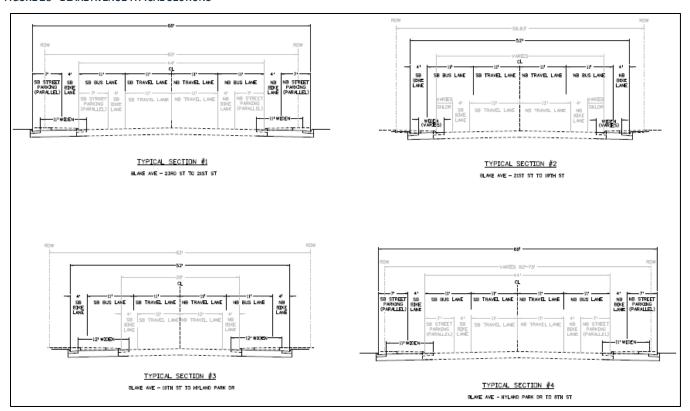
BLAKE AVENUE TYPICAL SECTIONS
